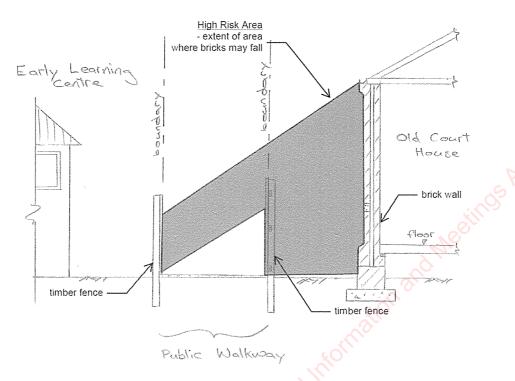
Section through Old Court House west wall showing extent of High Risk Area
